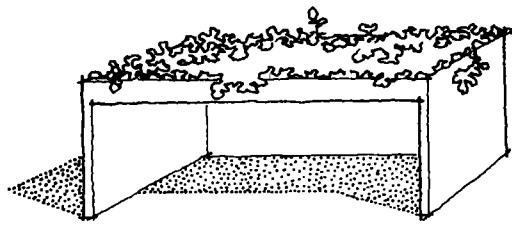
Shading provided by grass or creeping plants. The necessary earth will increase the heat storage capacity of the roof. Attention should be paid to the fact that the roots of certain creeping plants are able to penetrate and spoil the roof.
